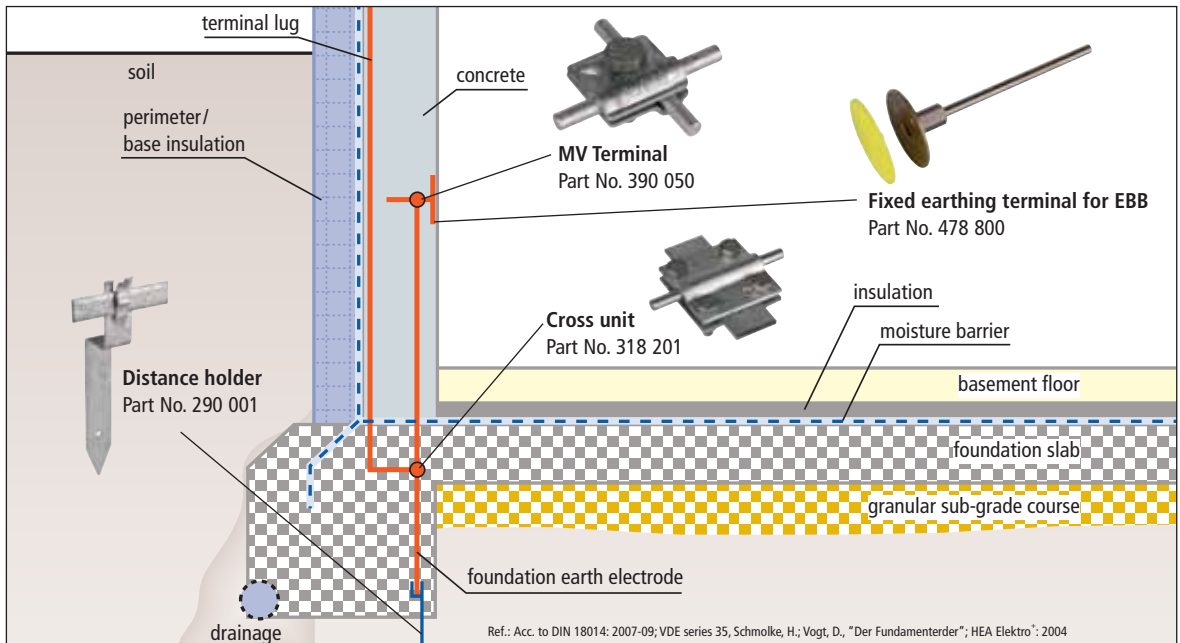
Arrangement of a foundation earth electrode in a strip foundation (insulated basement wall)
